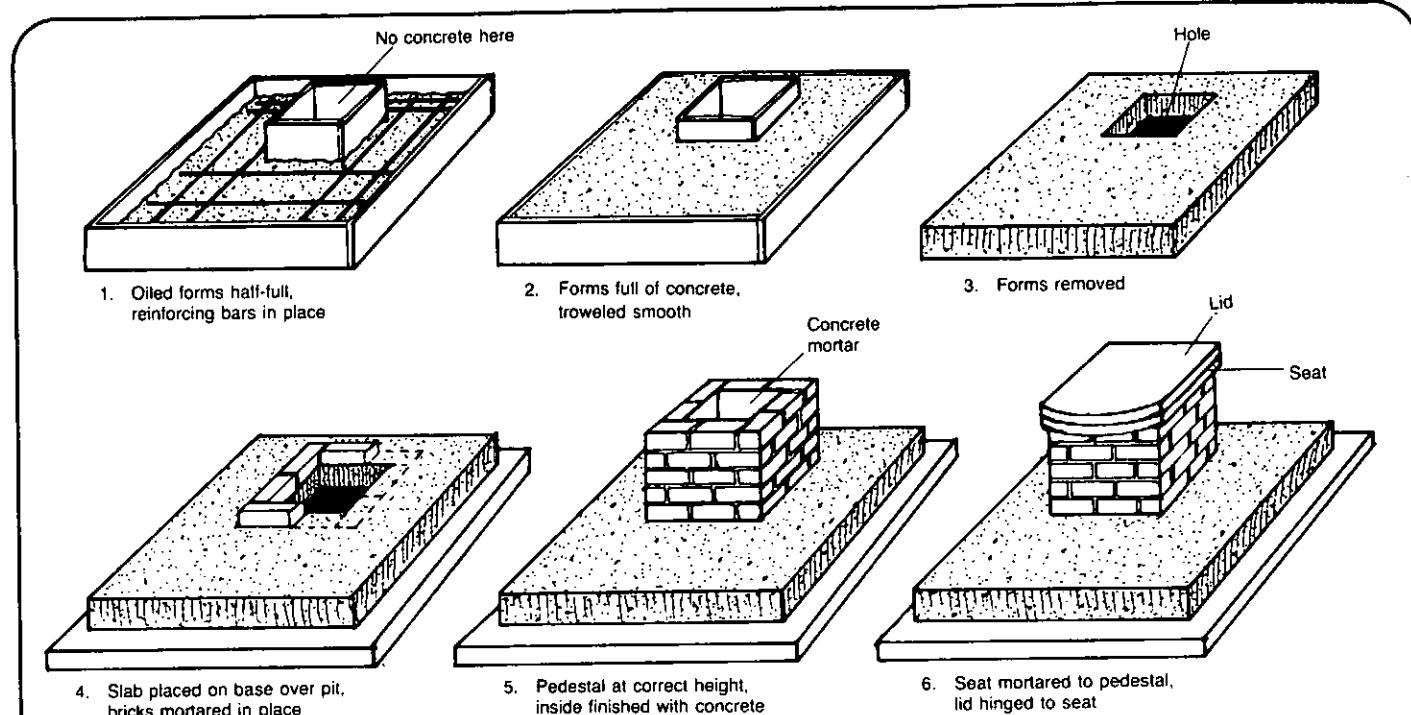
Constructing a Concrete Sitting Slab with Brick and Mortar Pedestal
